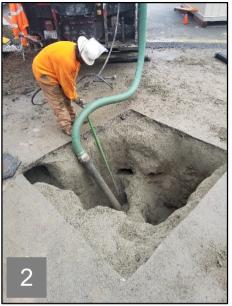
Drilling the Horizontal SVE Well Photo 2 – Using Hydrovac to Expose Fuel Pipelines Photo 3 – Installing the Horizontal Biosparge Well Vault
